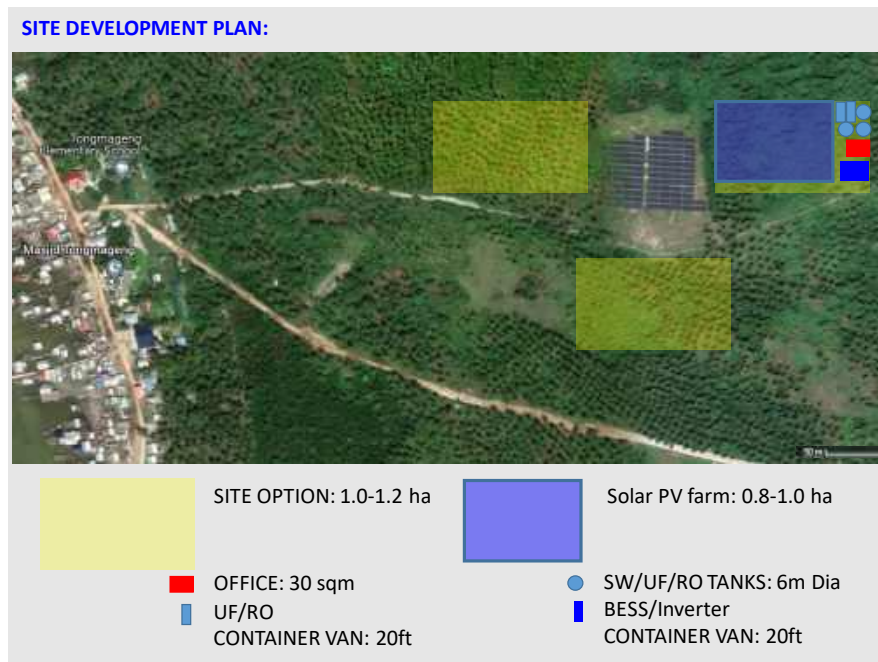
Schematic layout of the development site for the SWRO desalination and PV plant
